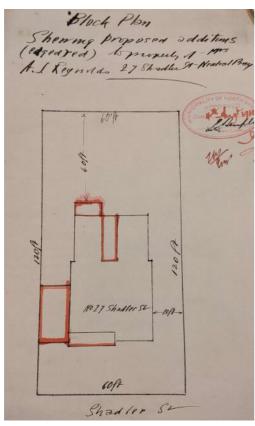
Block plan accompanying building application for '27 Shadler Street', 1 August 1911. (Source: North Sydney Heritage Centre, Stanton Library, NSCMA 91/5.36, Box 6, Folder R, 1911)
